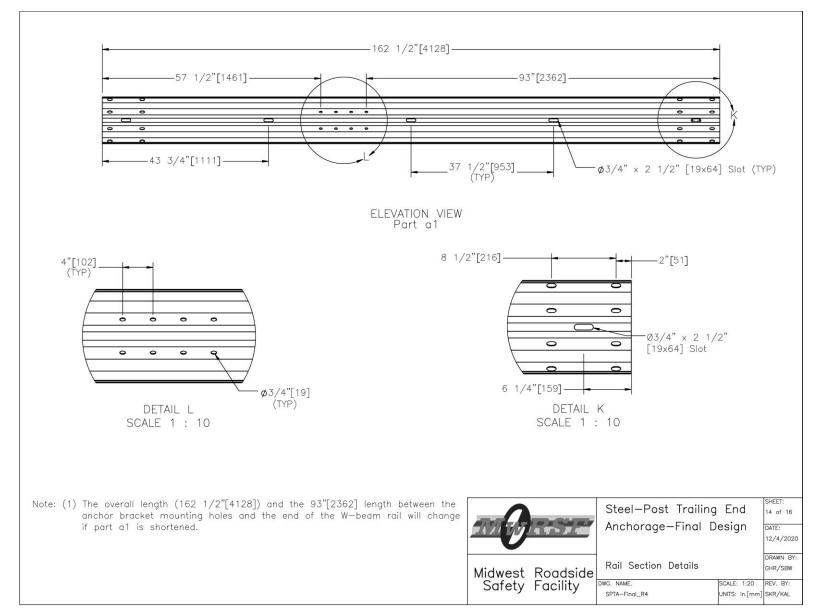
Steel-Post Trailing End Anchorage, Rail Section Details
